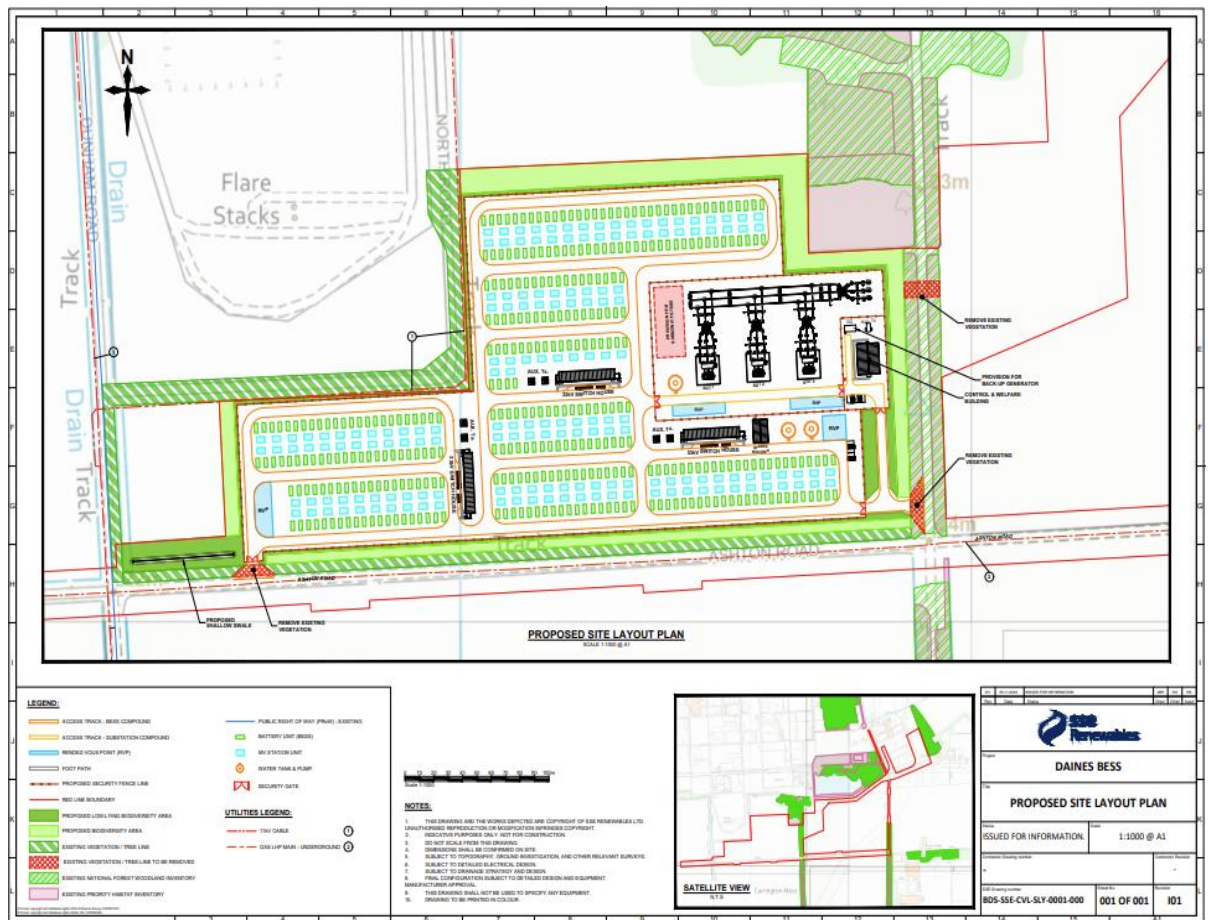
Proposed Site Layout (Ref. BDS-SSE-CVL-SLY-0001-000)
